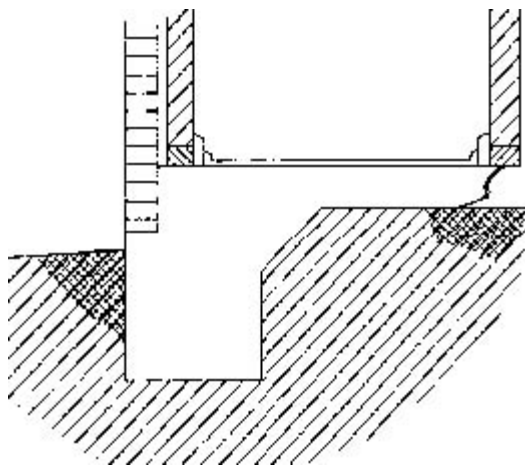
Completed treatment of monolithic slab with tile floor (dark shading indicates treated areas)
